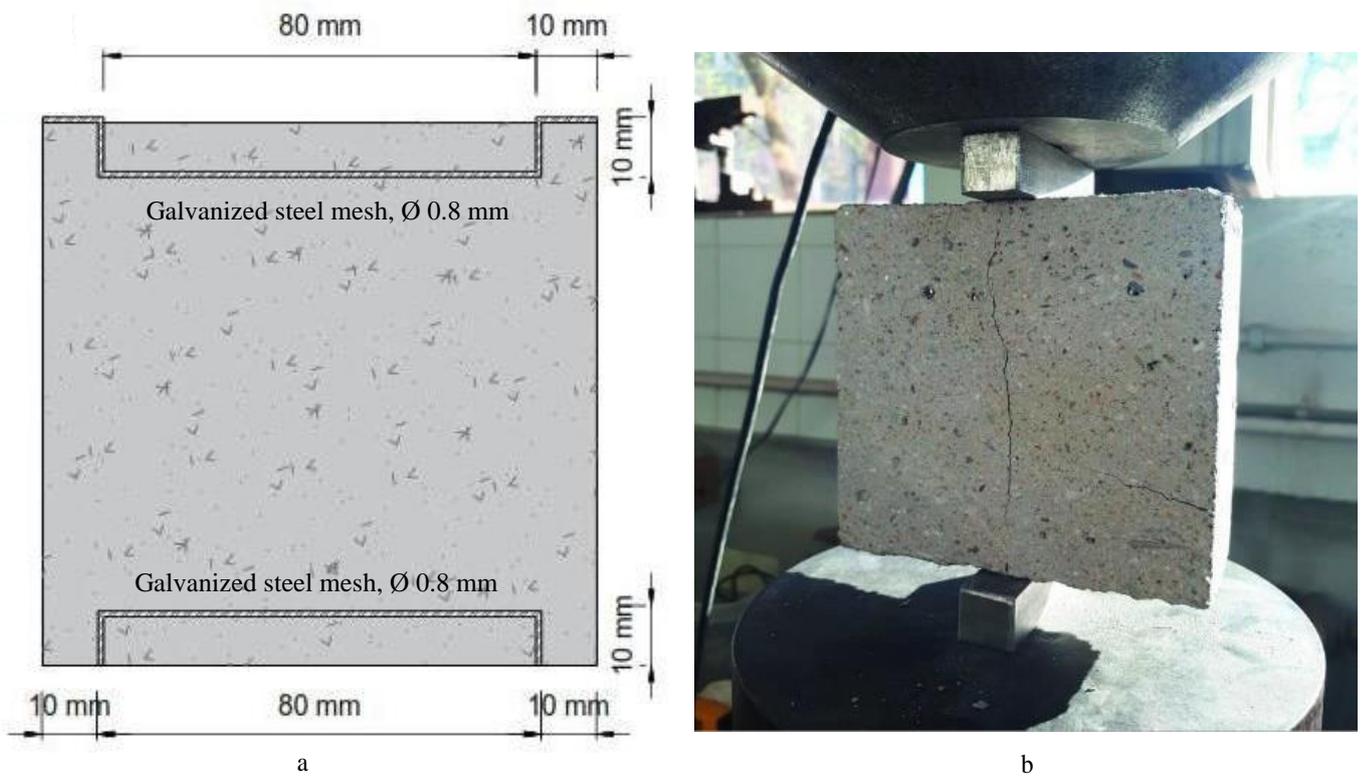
(a) Steel mesh scheme and (b) cracking of the specimen by a point load.
